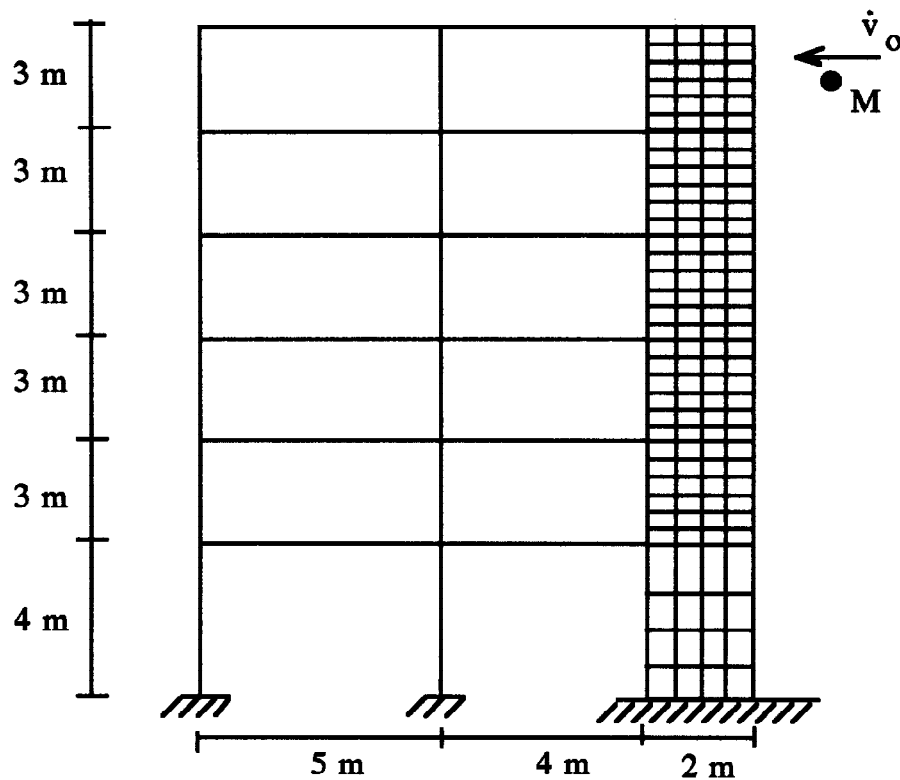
Finite element modelling of a 5-story building with a bumper wall
